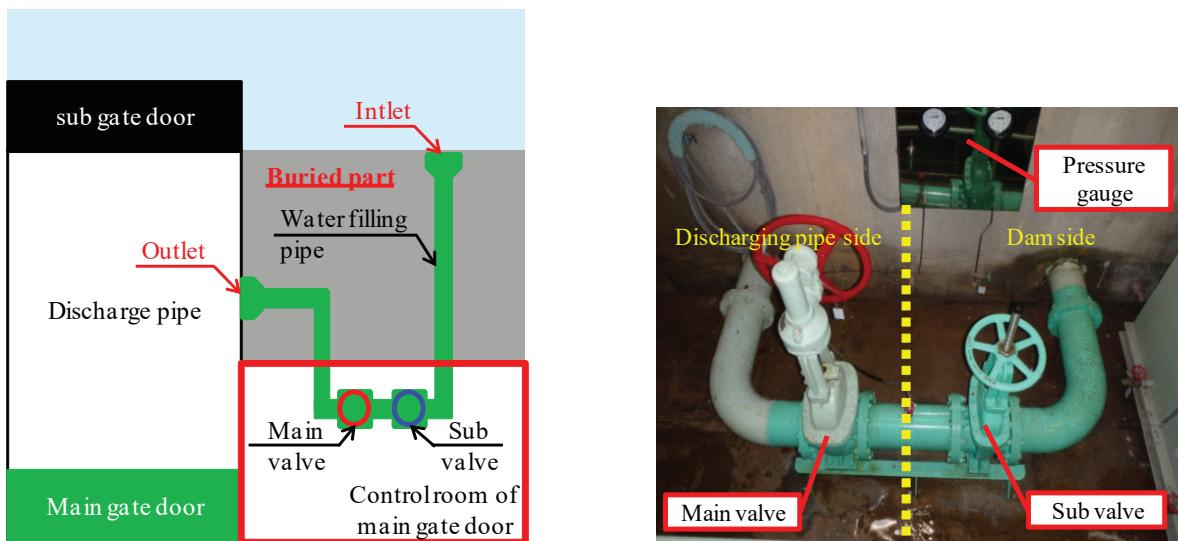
Structure diagram of water filling system and water filling system (exposed piping)
